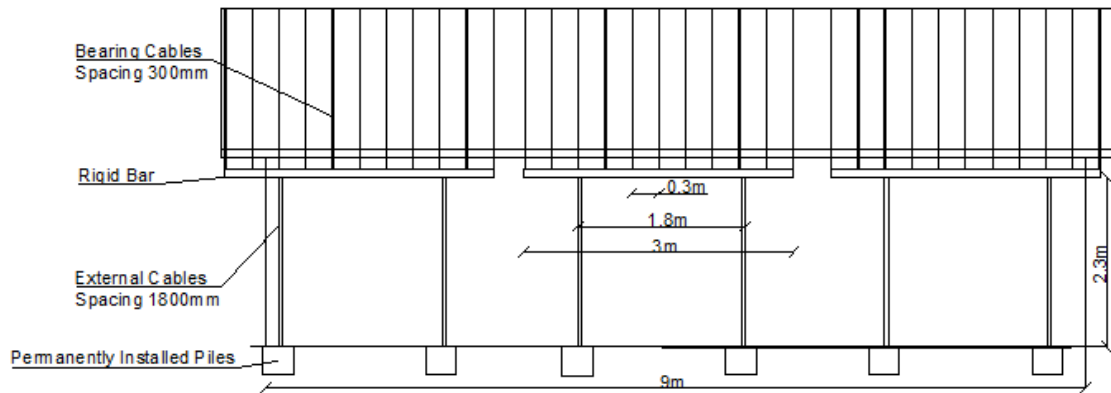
Elevation view of proposed retrofit system as applied to a gable-style roof
